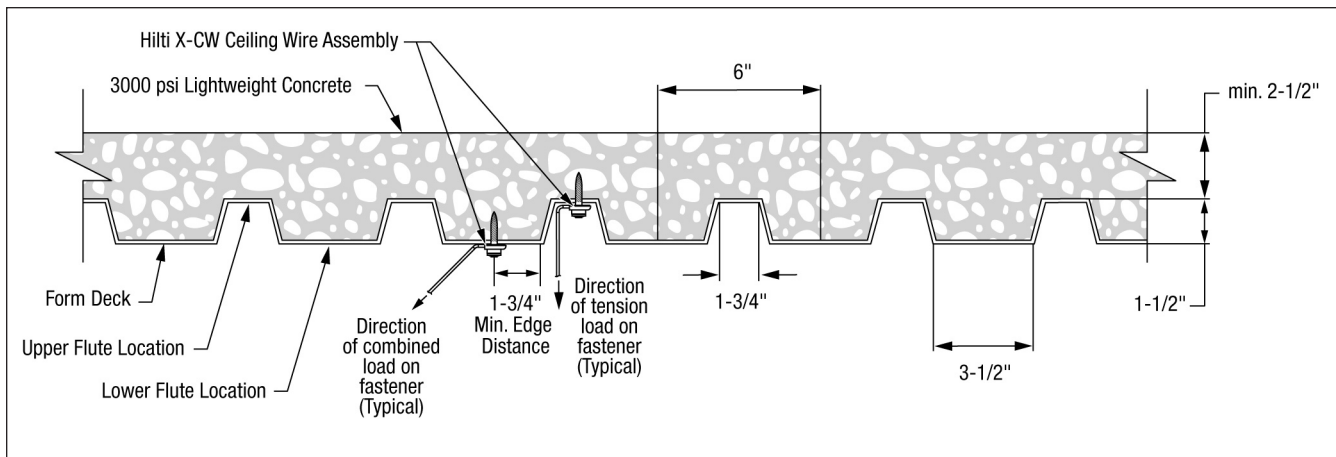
Hilti X-CW Ceiling Wire Assembly Location in 1-1/2-in.-Deep Composite Floor Deck, Inverted Deck Profile Orientation
